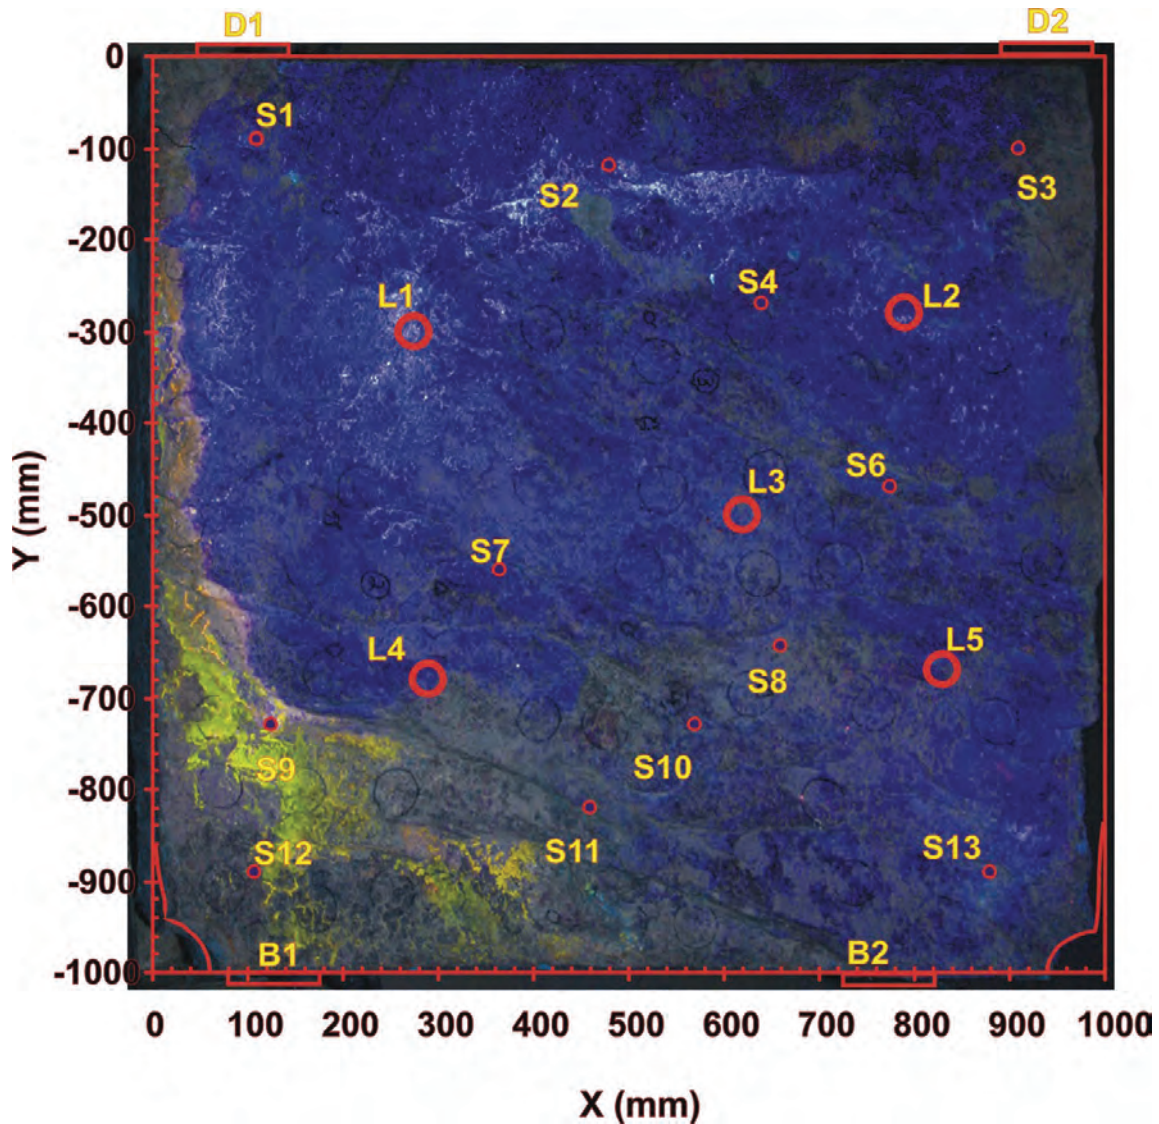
Bottom Fracture Surface Under UV Light, Showing Selected Boreholes
